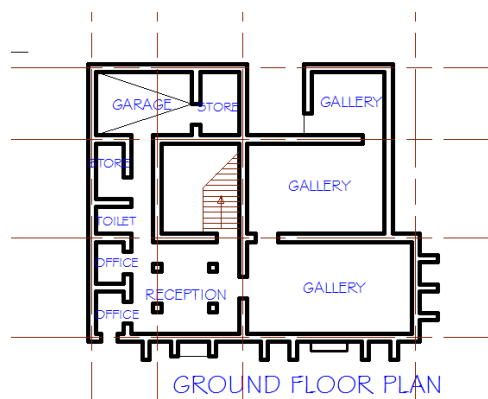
Ground floor plan of the *Gidan Dan-Hausa* residential section source: authors fieldwork
